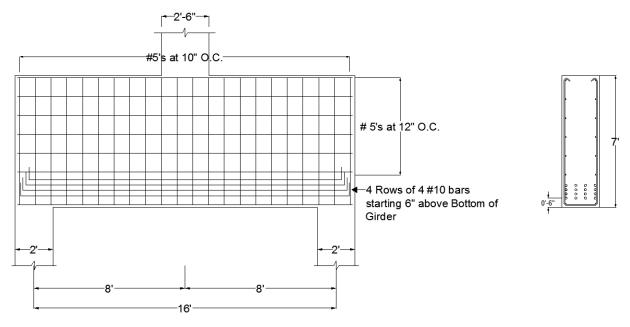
STM Design Example 1 - Final Design Cut Sections
